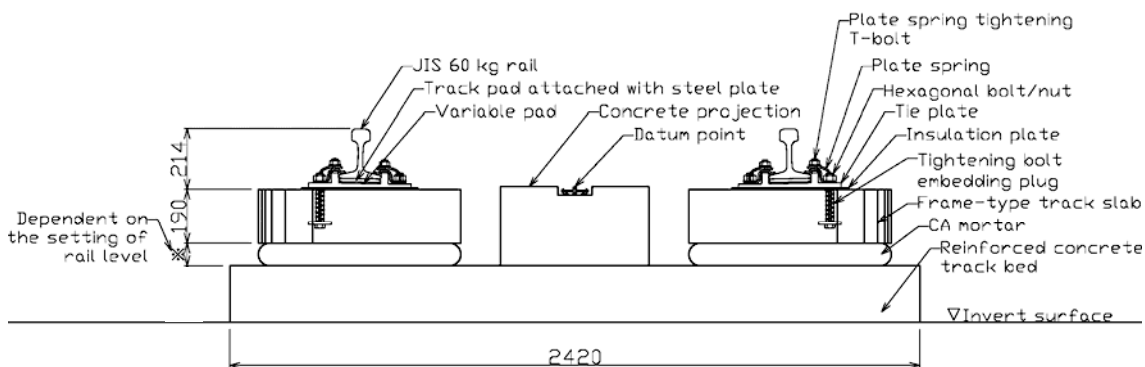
Standard Cross-Section of the Tracks in Tunnel Sections
